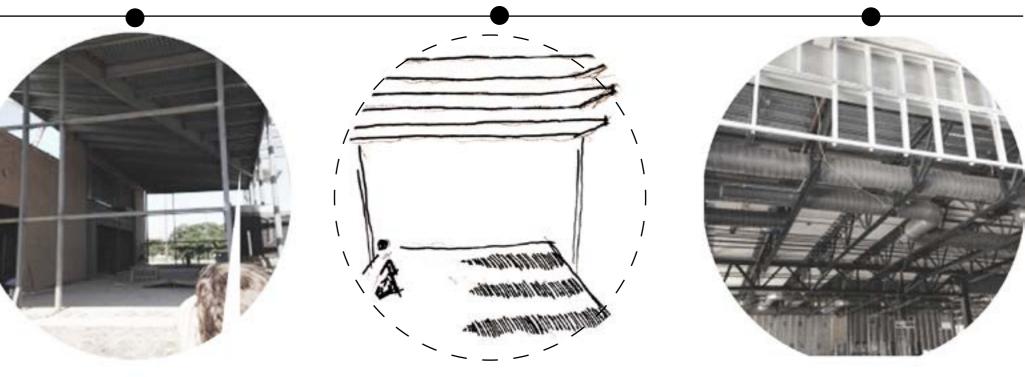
BP: Acoustic roof installation (Brooke, 2014: online)
